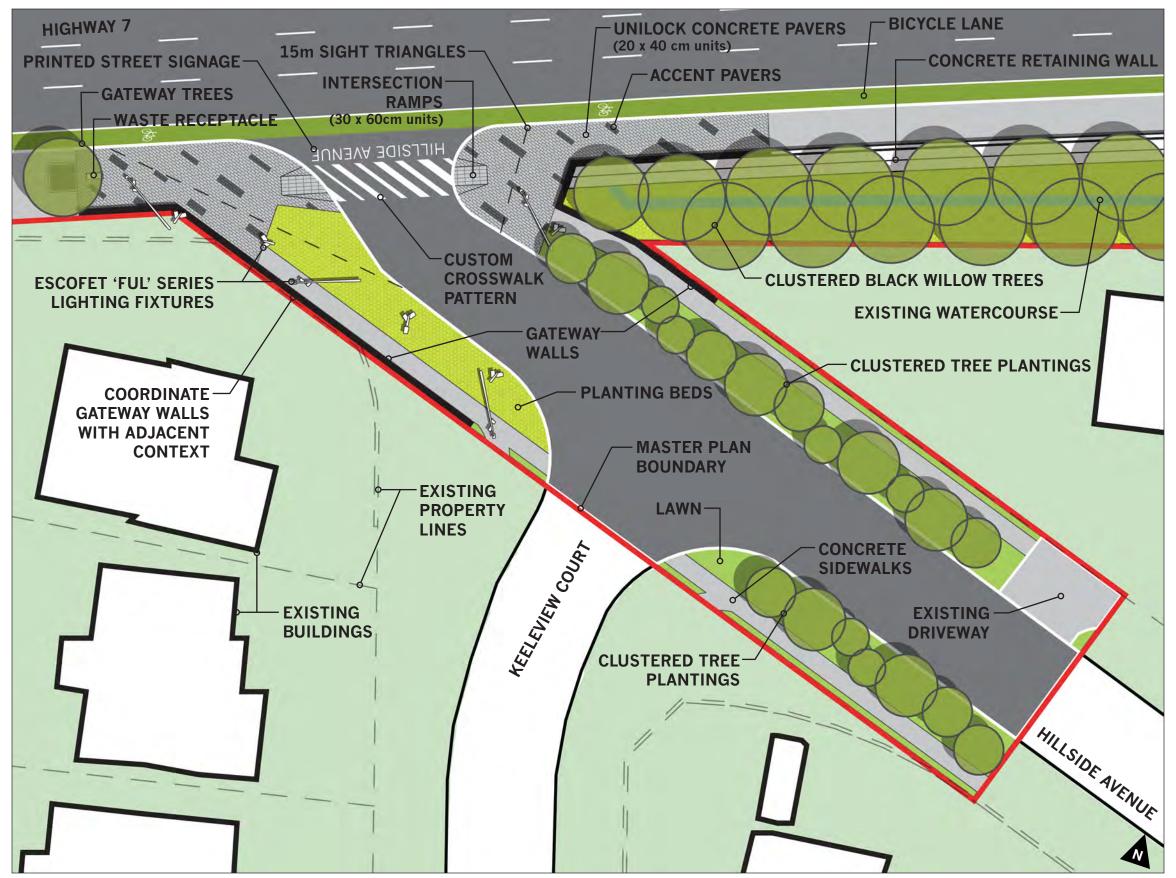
Hillside Avenue Gateway streetscape concept (secondary gateway).
